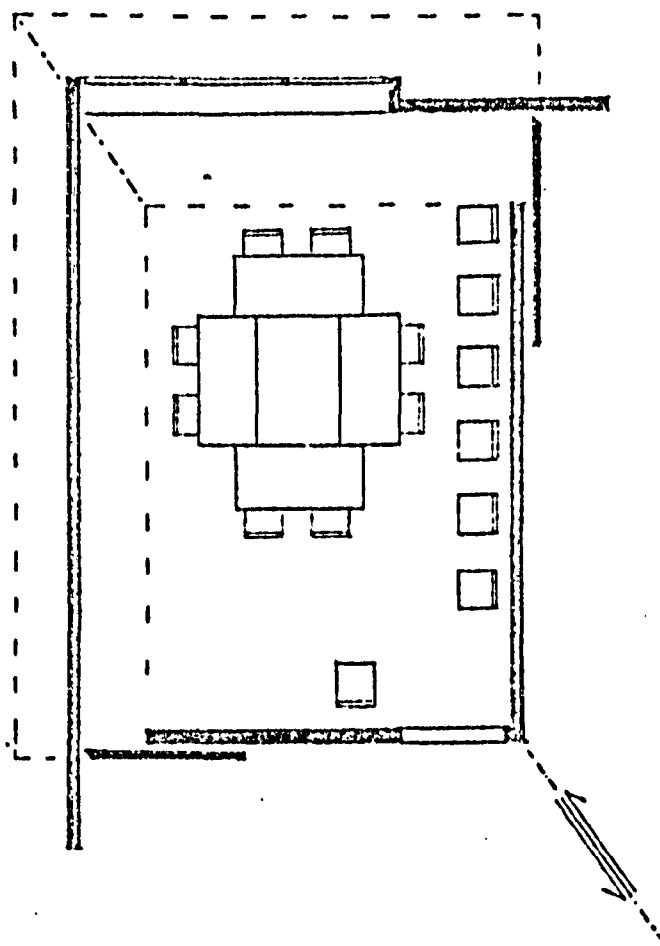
1/10 plan of adjustable model in condition I; three-bay window, root two proportion, window on short wall.
